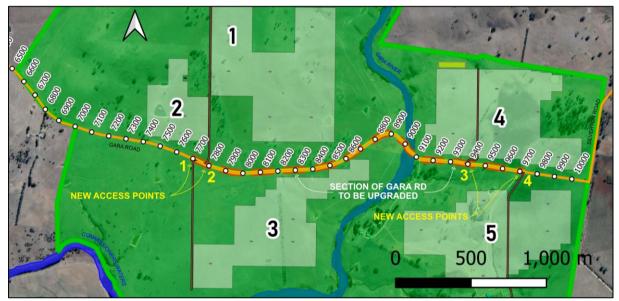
Location of Proposed Property Access Driveways off Gara Road
